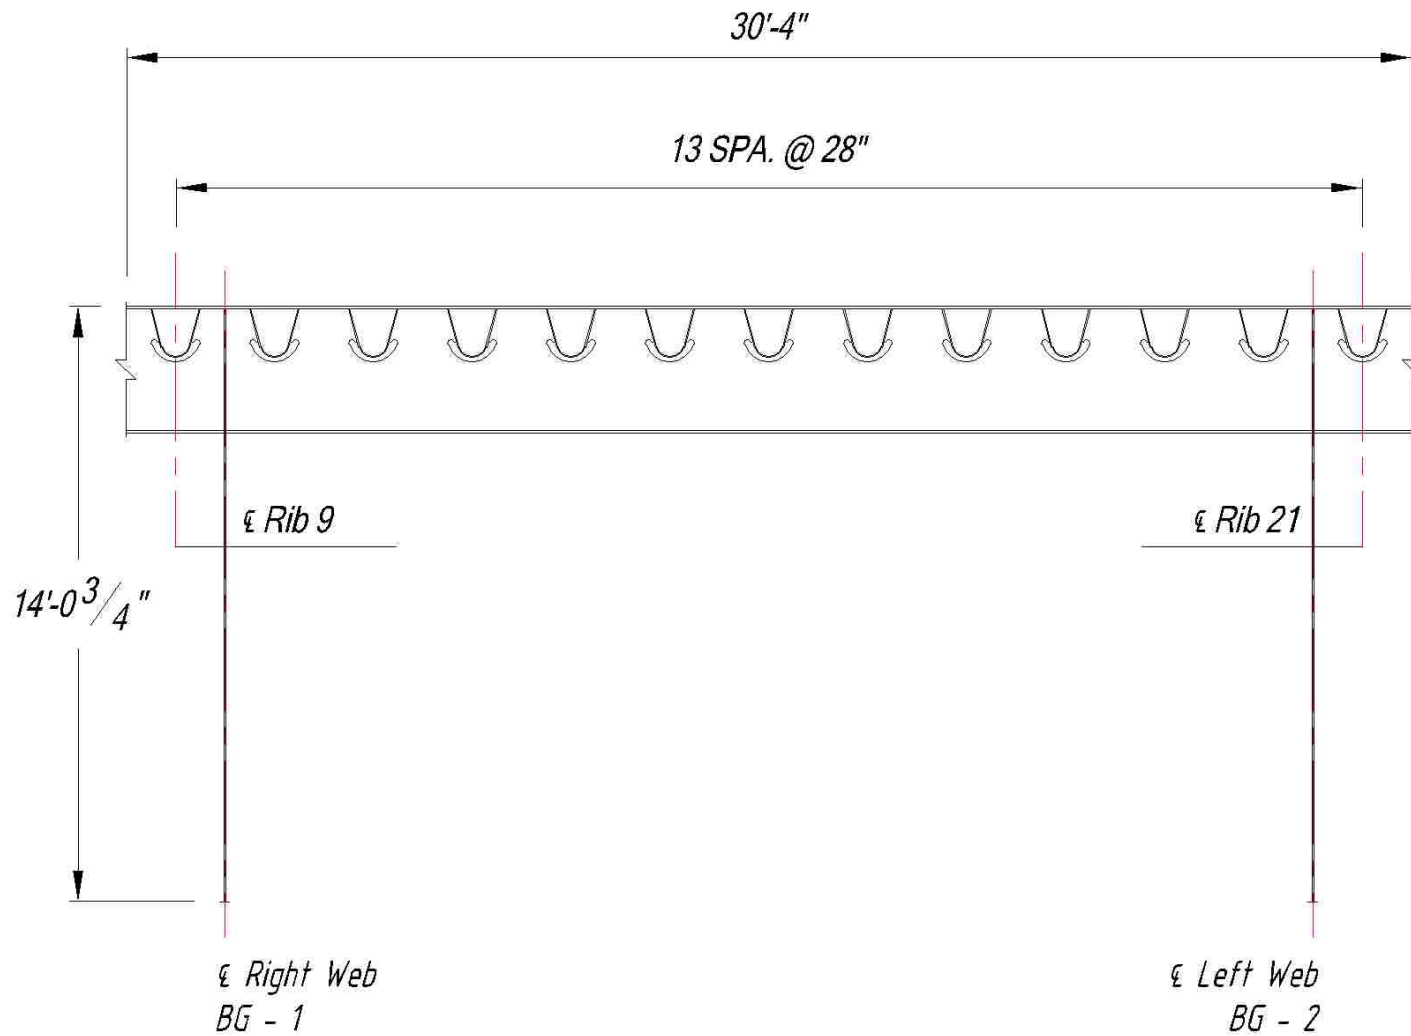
Cross section of Submodel B with connection Type 5B looking east
